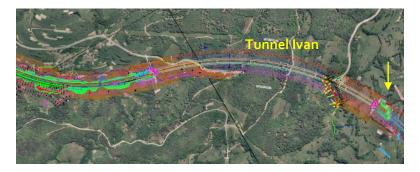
Section Tarcin - Tunnel Ivan (source: FBHM)
